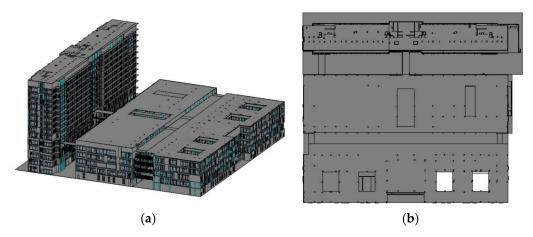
Revit model of the Maluan Bay Hospital: (a) elevation view; (b) plan view.
